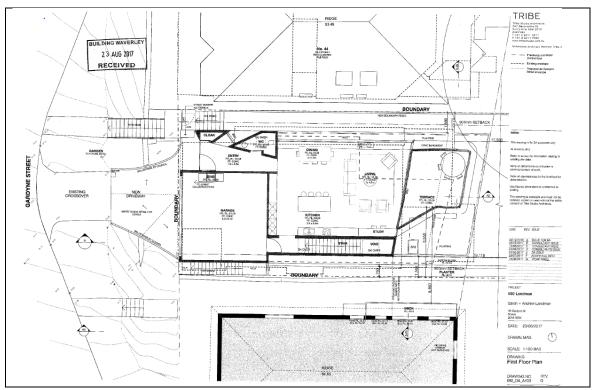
Proposed first floor plan showing approved rear terrace area based on plan submitted and tabled at WDAP meeting of 23 August 2017
